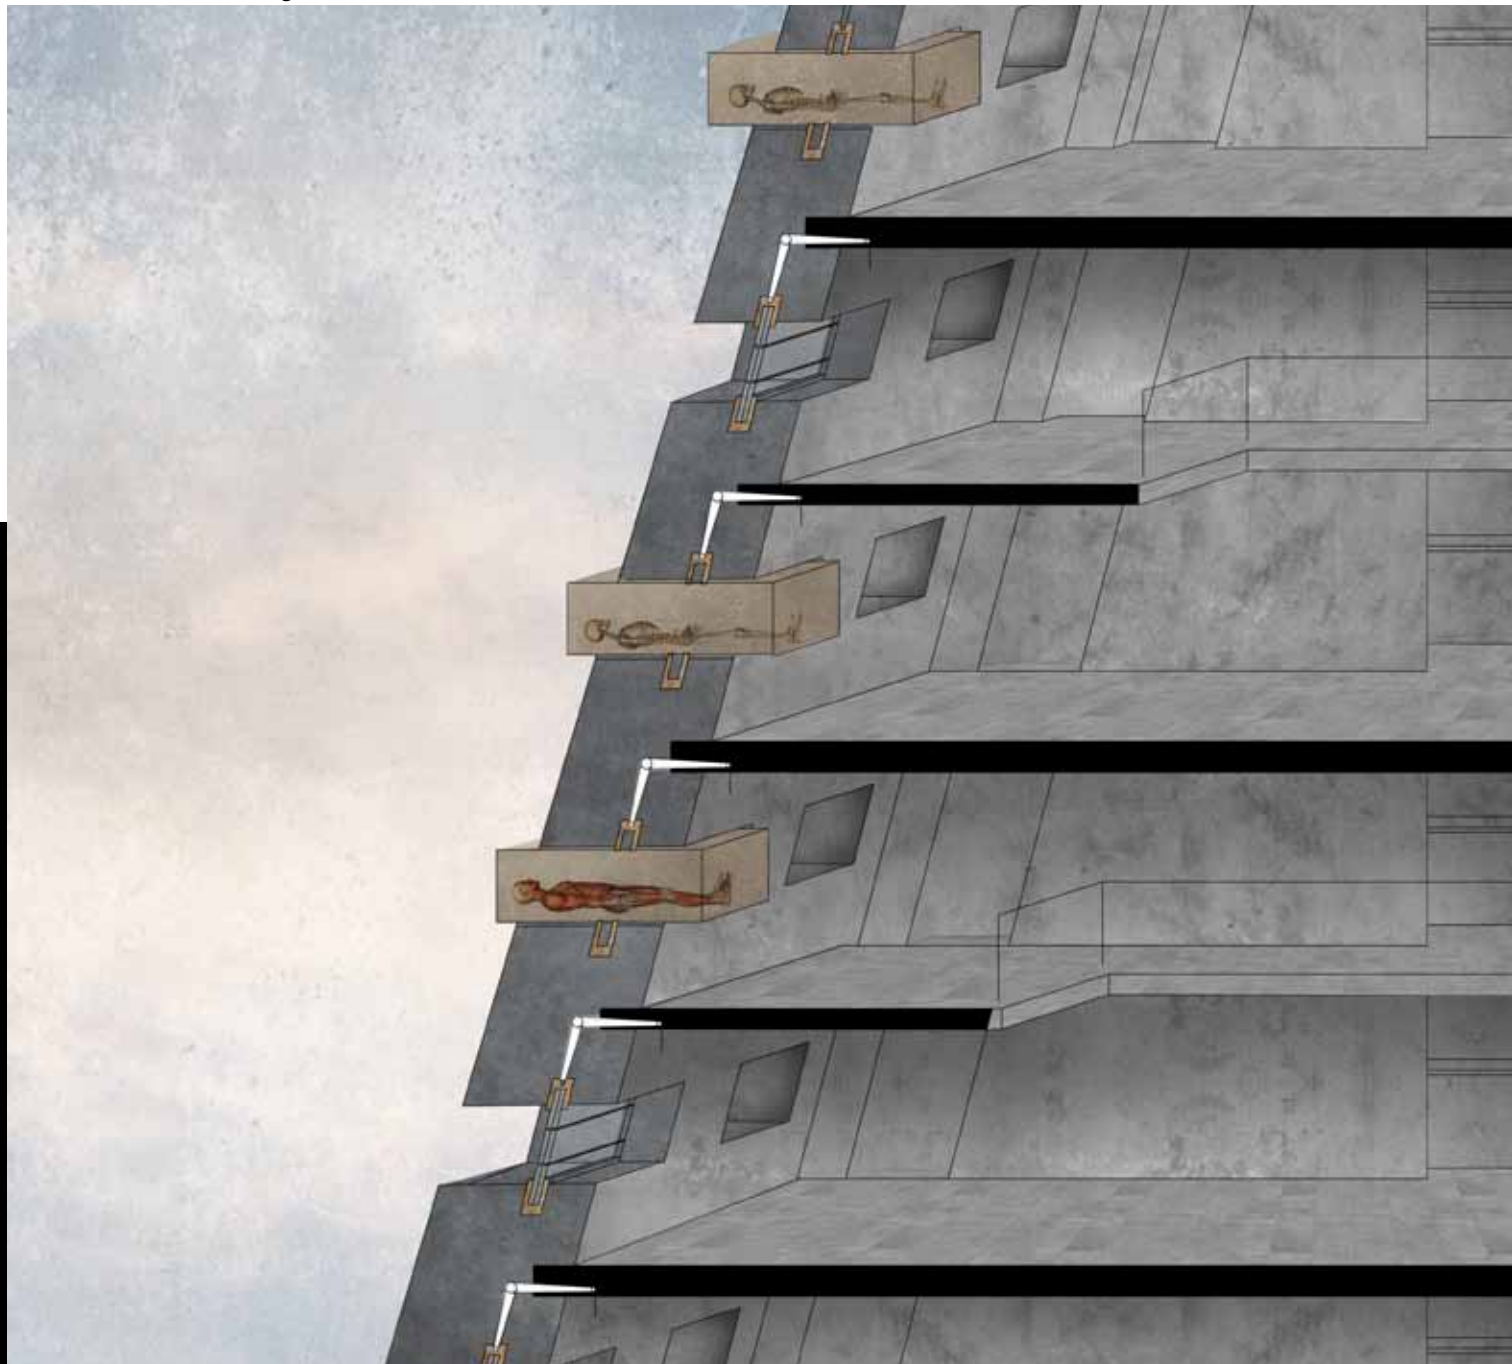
Wall of Dead section, Showing the detail of how the coffins are placed in the wall.
